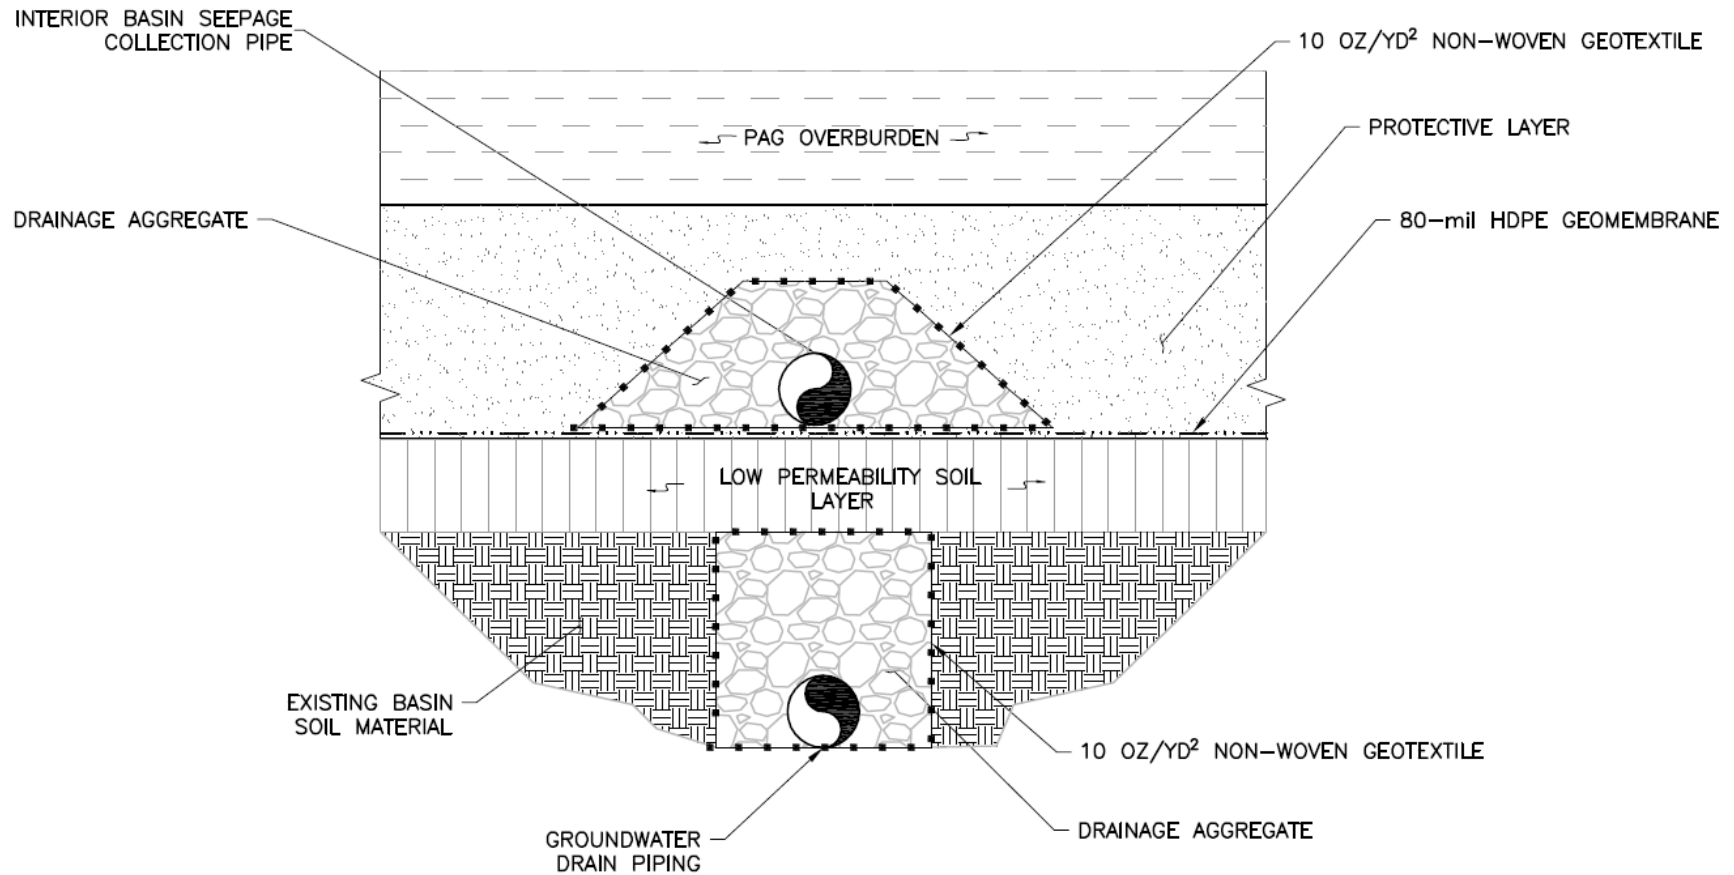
Cross Section of Johnny's PAG Groundwater Drain and Seepage Collection System
